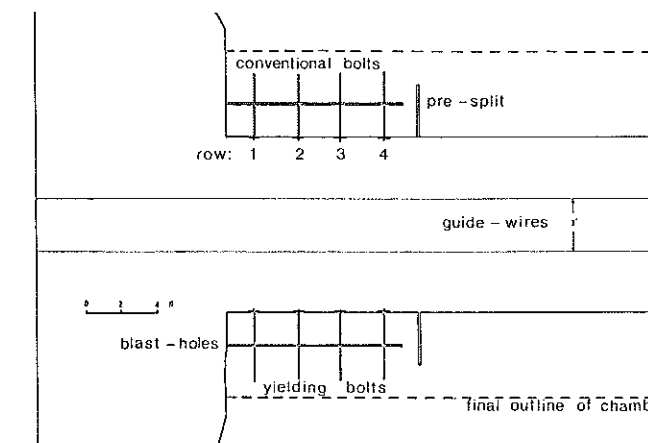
Plan of 68 L Fan Chamber—First Test Blast.
